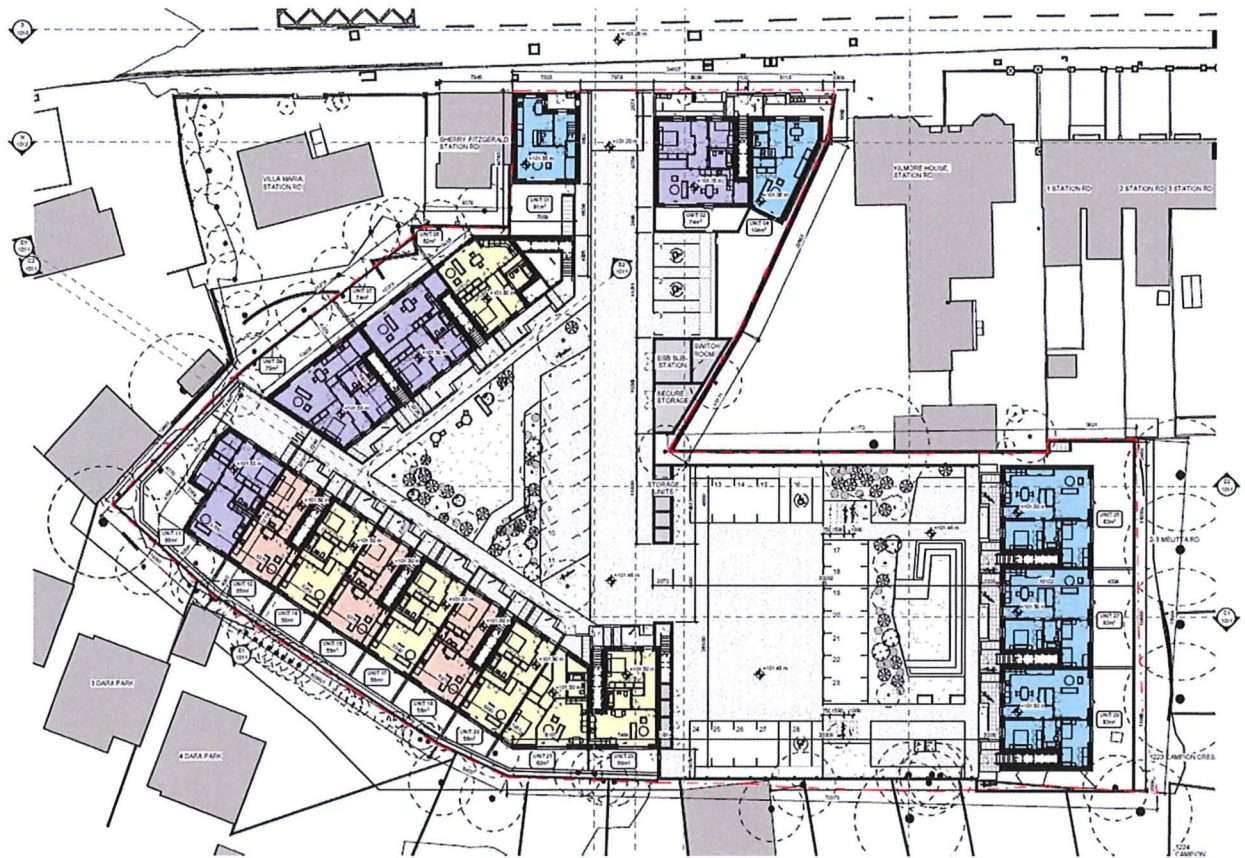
Proposed ground floor plan. Source: Shay Cleary Architects.
